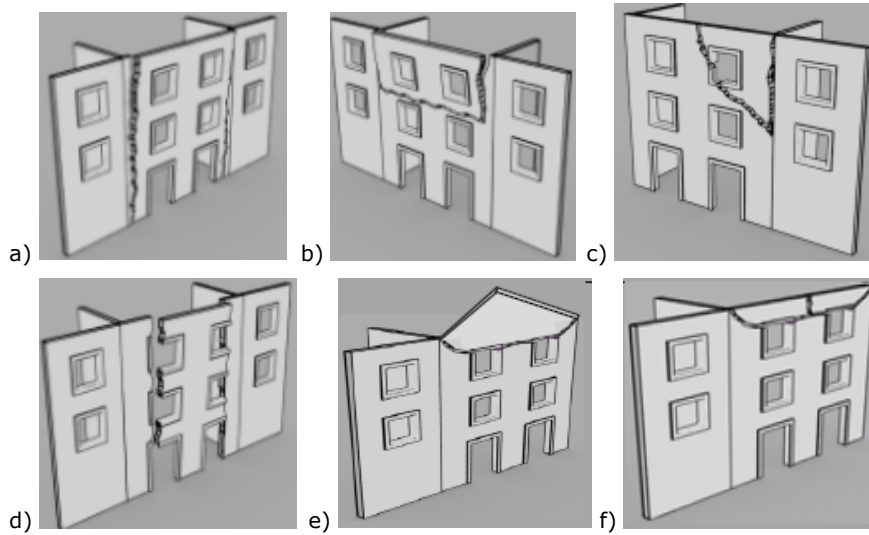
Typical out-of-plane failure mechanisms for masonry buildings: a),b) overturning because of lack of connection, both sides; c) overturning in correspondence of the piers; d) overturning due to lack of connection, one side; e), f) arch failure; [191]
